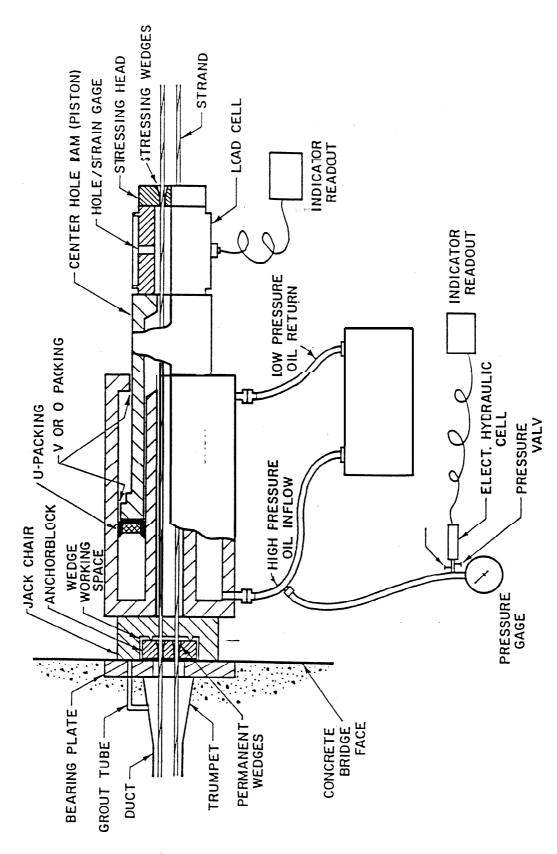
TYPICAL POST TENSIONING SYSTEM
